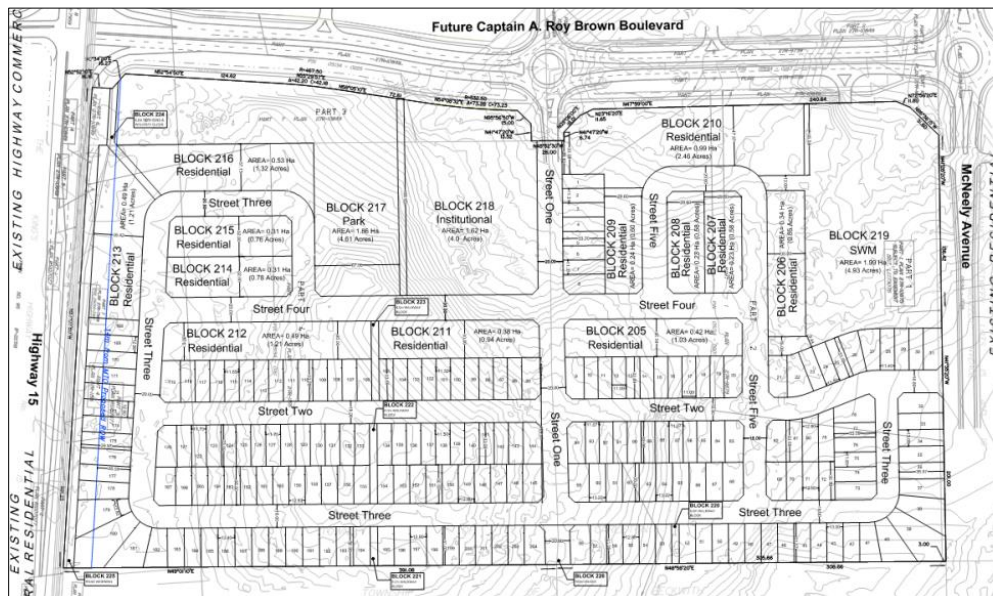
Draft Plan of Subdivision (McNeely Landing)
